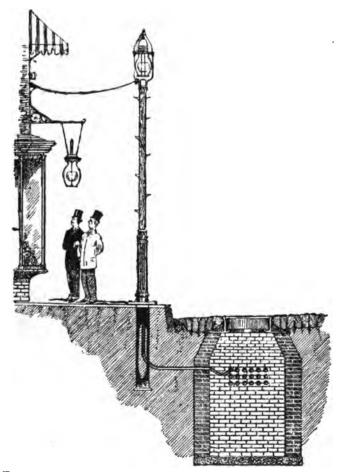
SECTION OF CONDUIT, WITH ARC LAMP CONNECTIONS.
